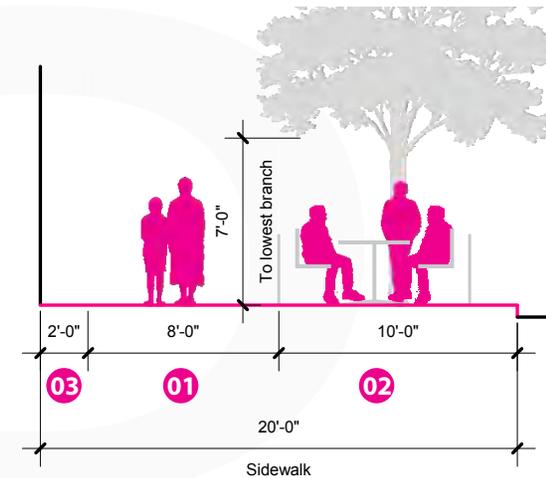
Sidewalk with expanded amenity zone for sidewalk cafe
